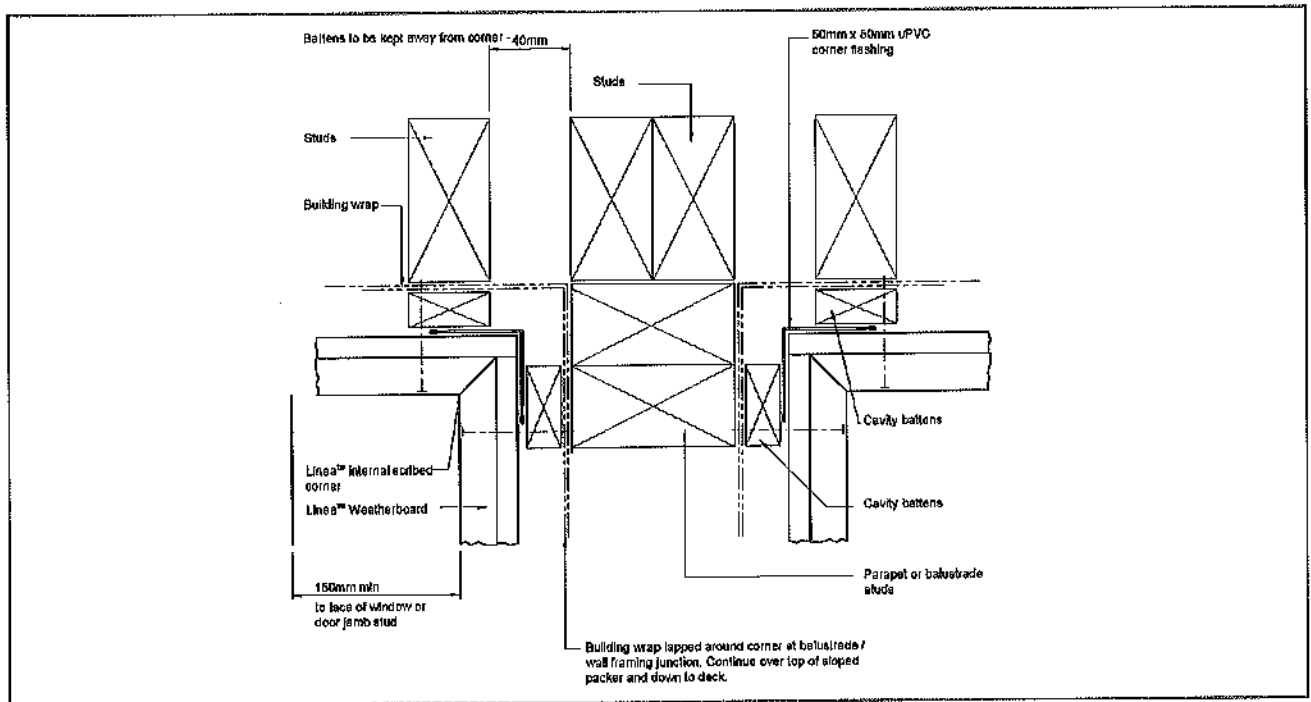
CAVITY ENCLOSED DECK BALUSTRADE TO WALL
